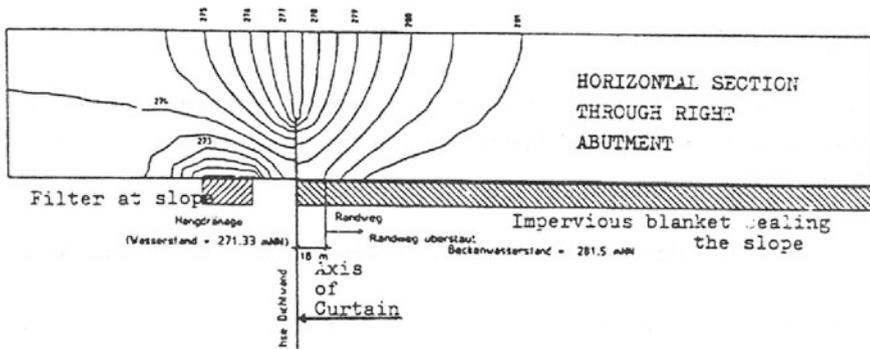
Modelling of seepage through right abutment at Haune Dam
